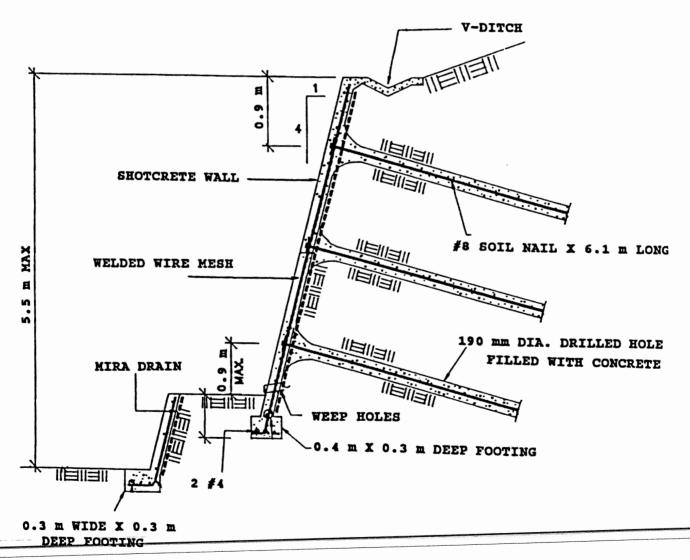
Cross section of a permanent soil-nailed retaining structure located in San Ramon (NME wall), Calif. (Barar, 1990).
